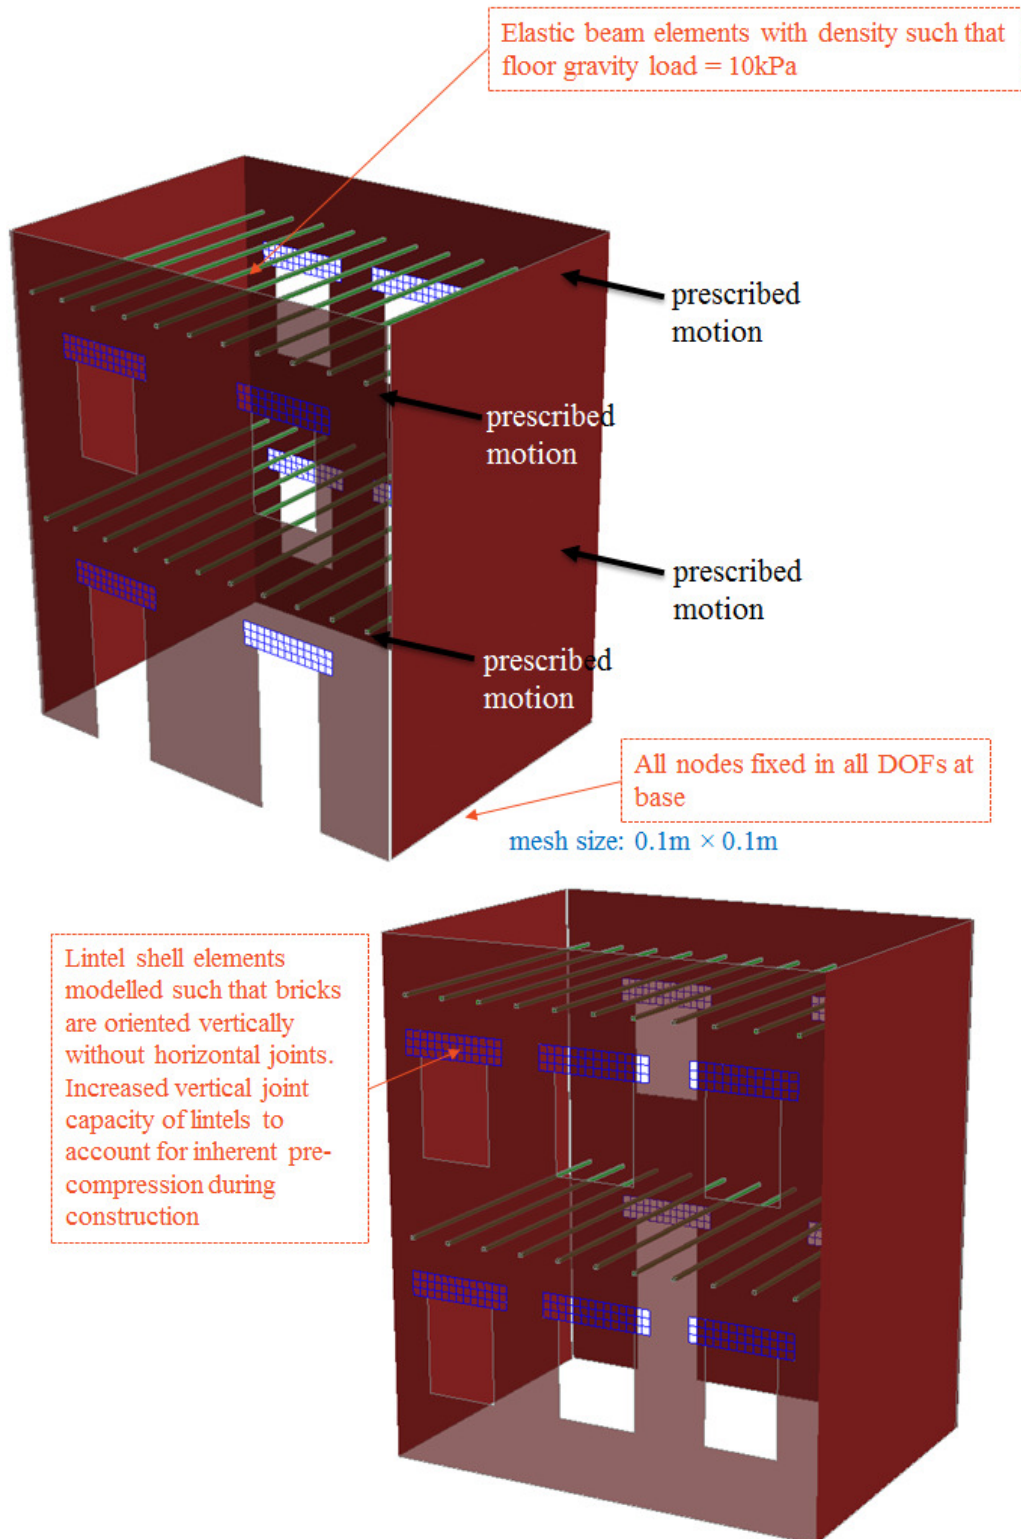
LS-DYNA shell model: door wall (top) and window wall (bottom)
